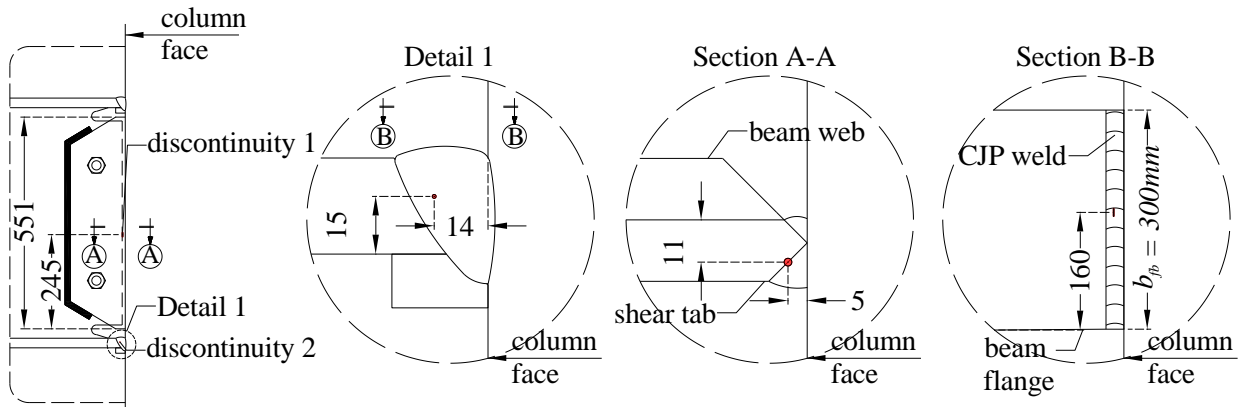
Identified locations of weld discontinuities after ultrasoning testing for Specimen 2 (unit: millimeters).
